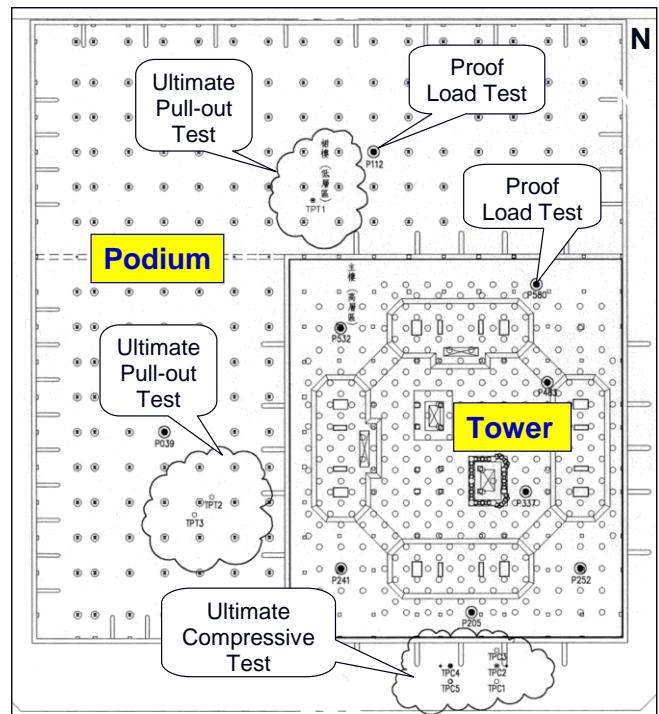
Layout of foundation plan and pile load test of Taipei 101
